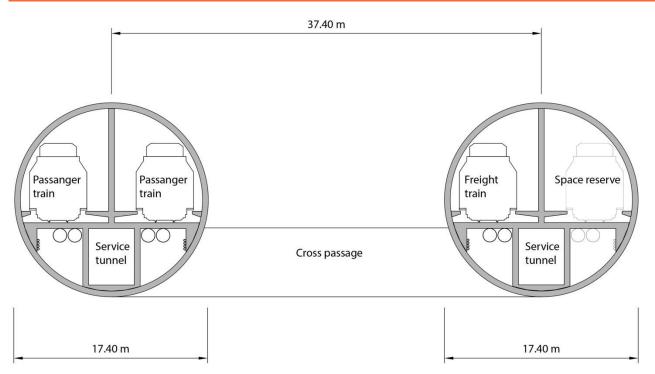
Cross-section of the railway tunnel in the Finest Bay Area alternatives.
